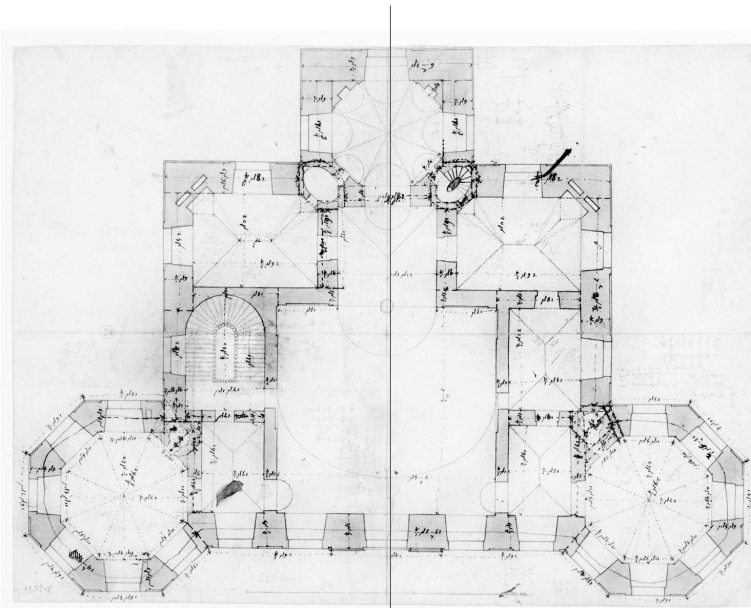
François d'Orbay, As-constructed plan drawing of the Observatory top floor showing the Grande Salon requested by Cassini. Note the revised stair plan.
